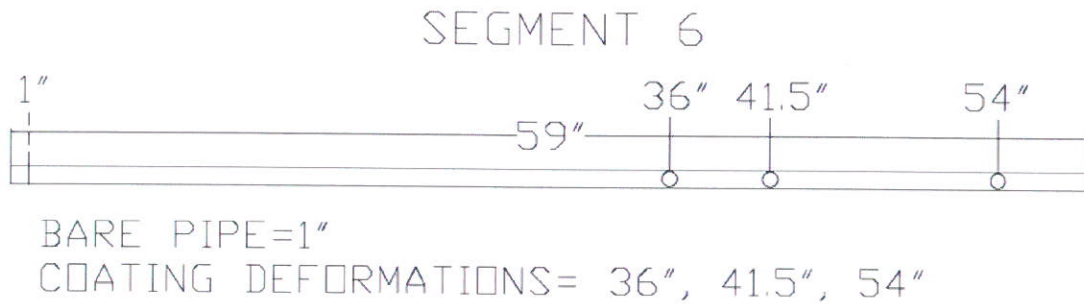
CAD schematic of Segment 6 showing the locations of coating deformations.
